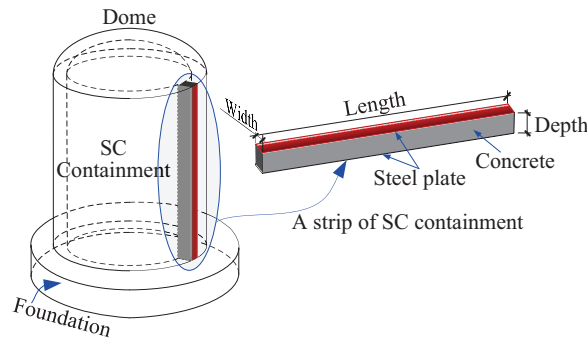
SC Nuclear containment and a strip of cylindrical wall
